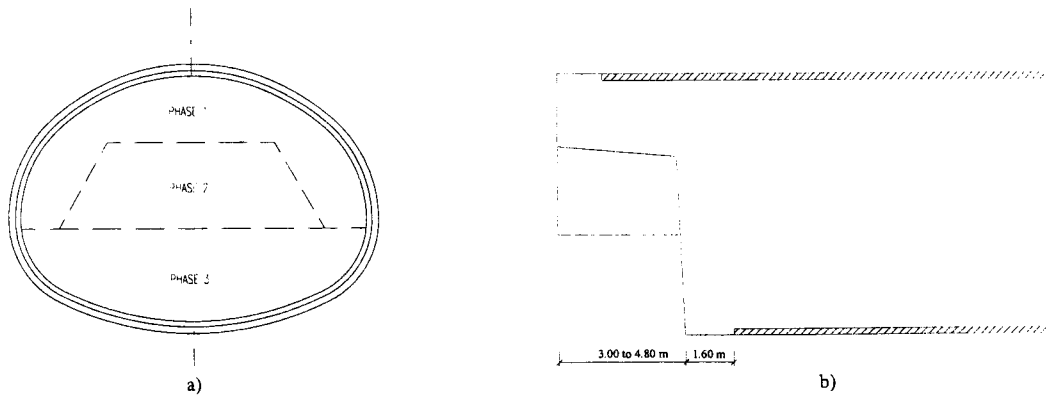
Construction process used: a) transverse section; b) longitudinal section
